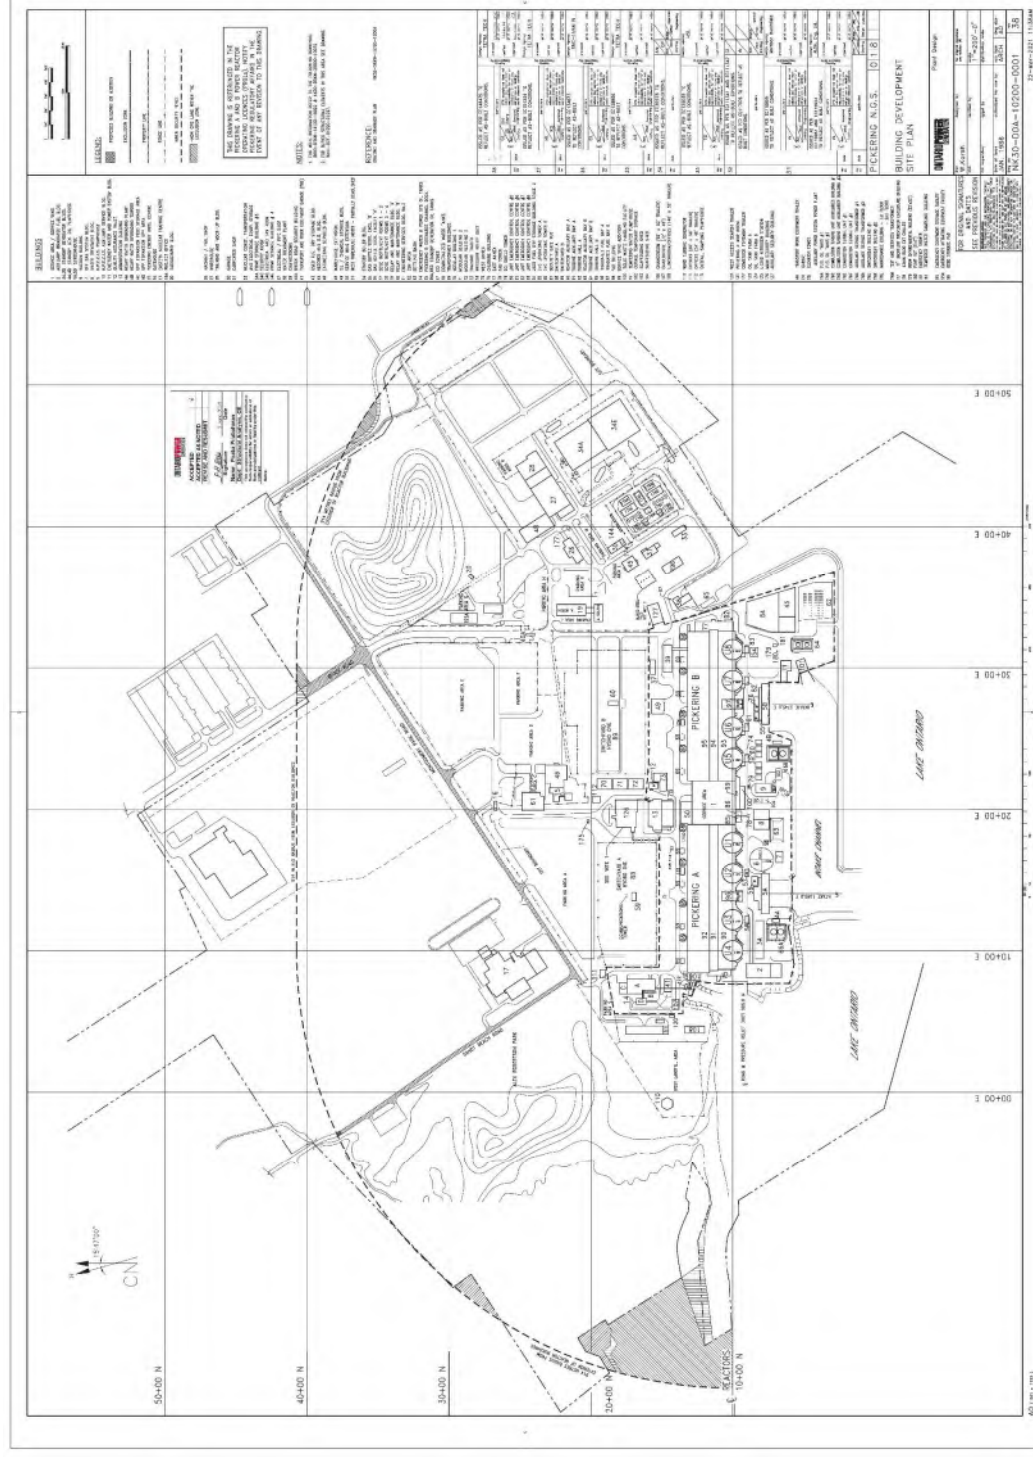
Pickering Nuclear Generation Station Site Plan
